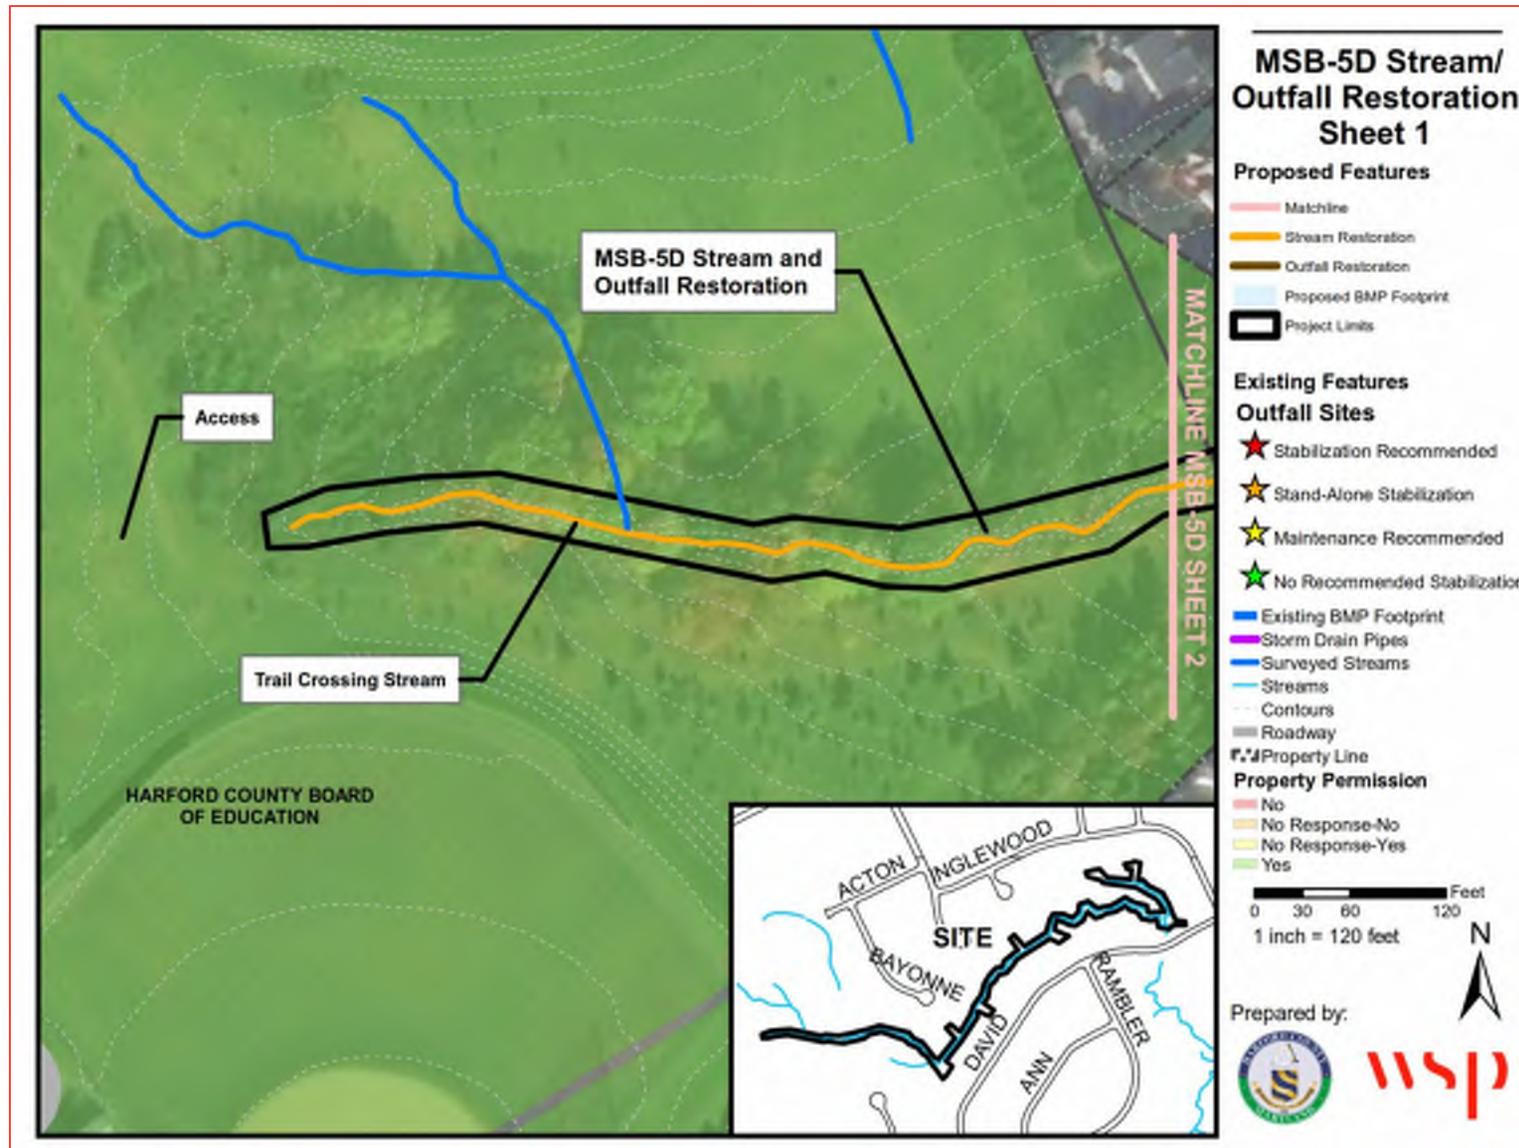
Site Location and Proposed Project Plan for MSB-5D Stream and Outfall Restoration (Sheet 1 of 4)
